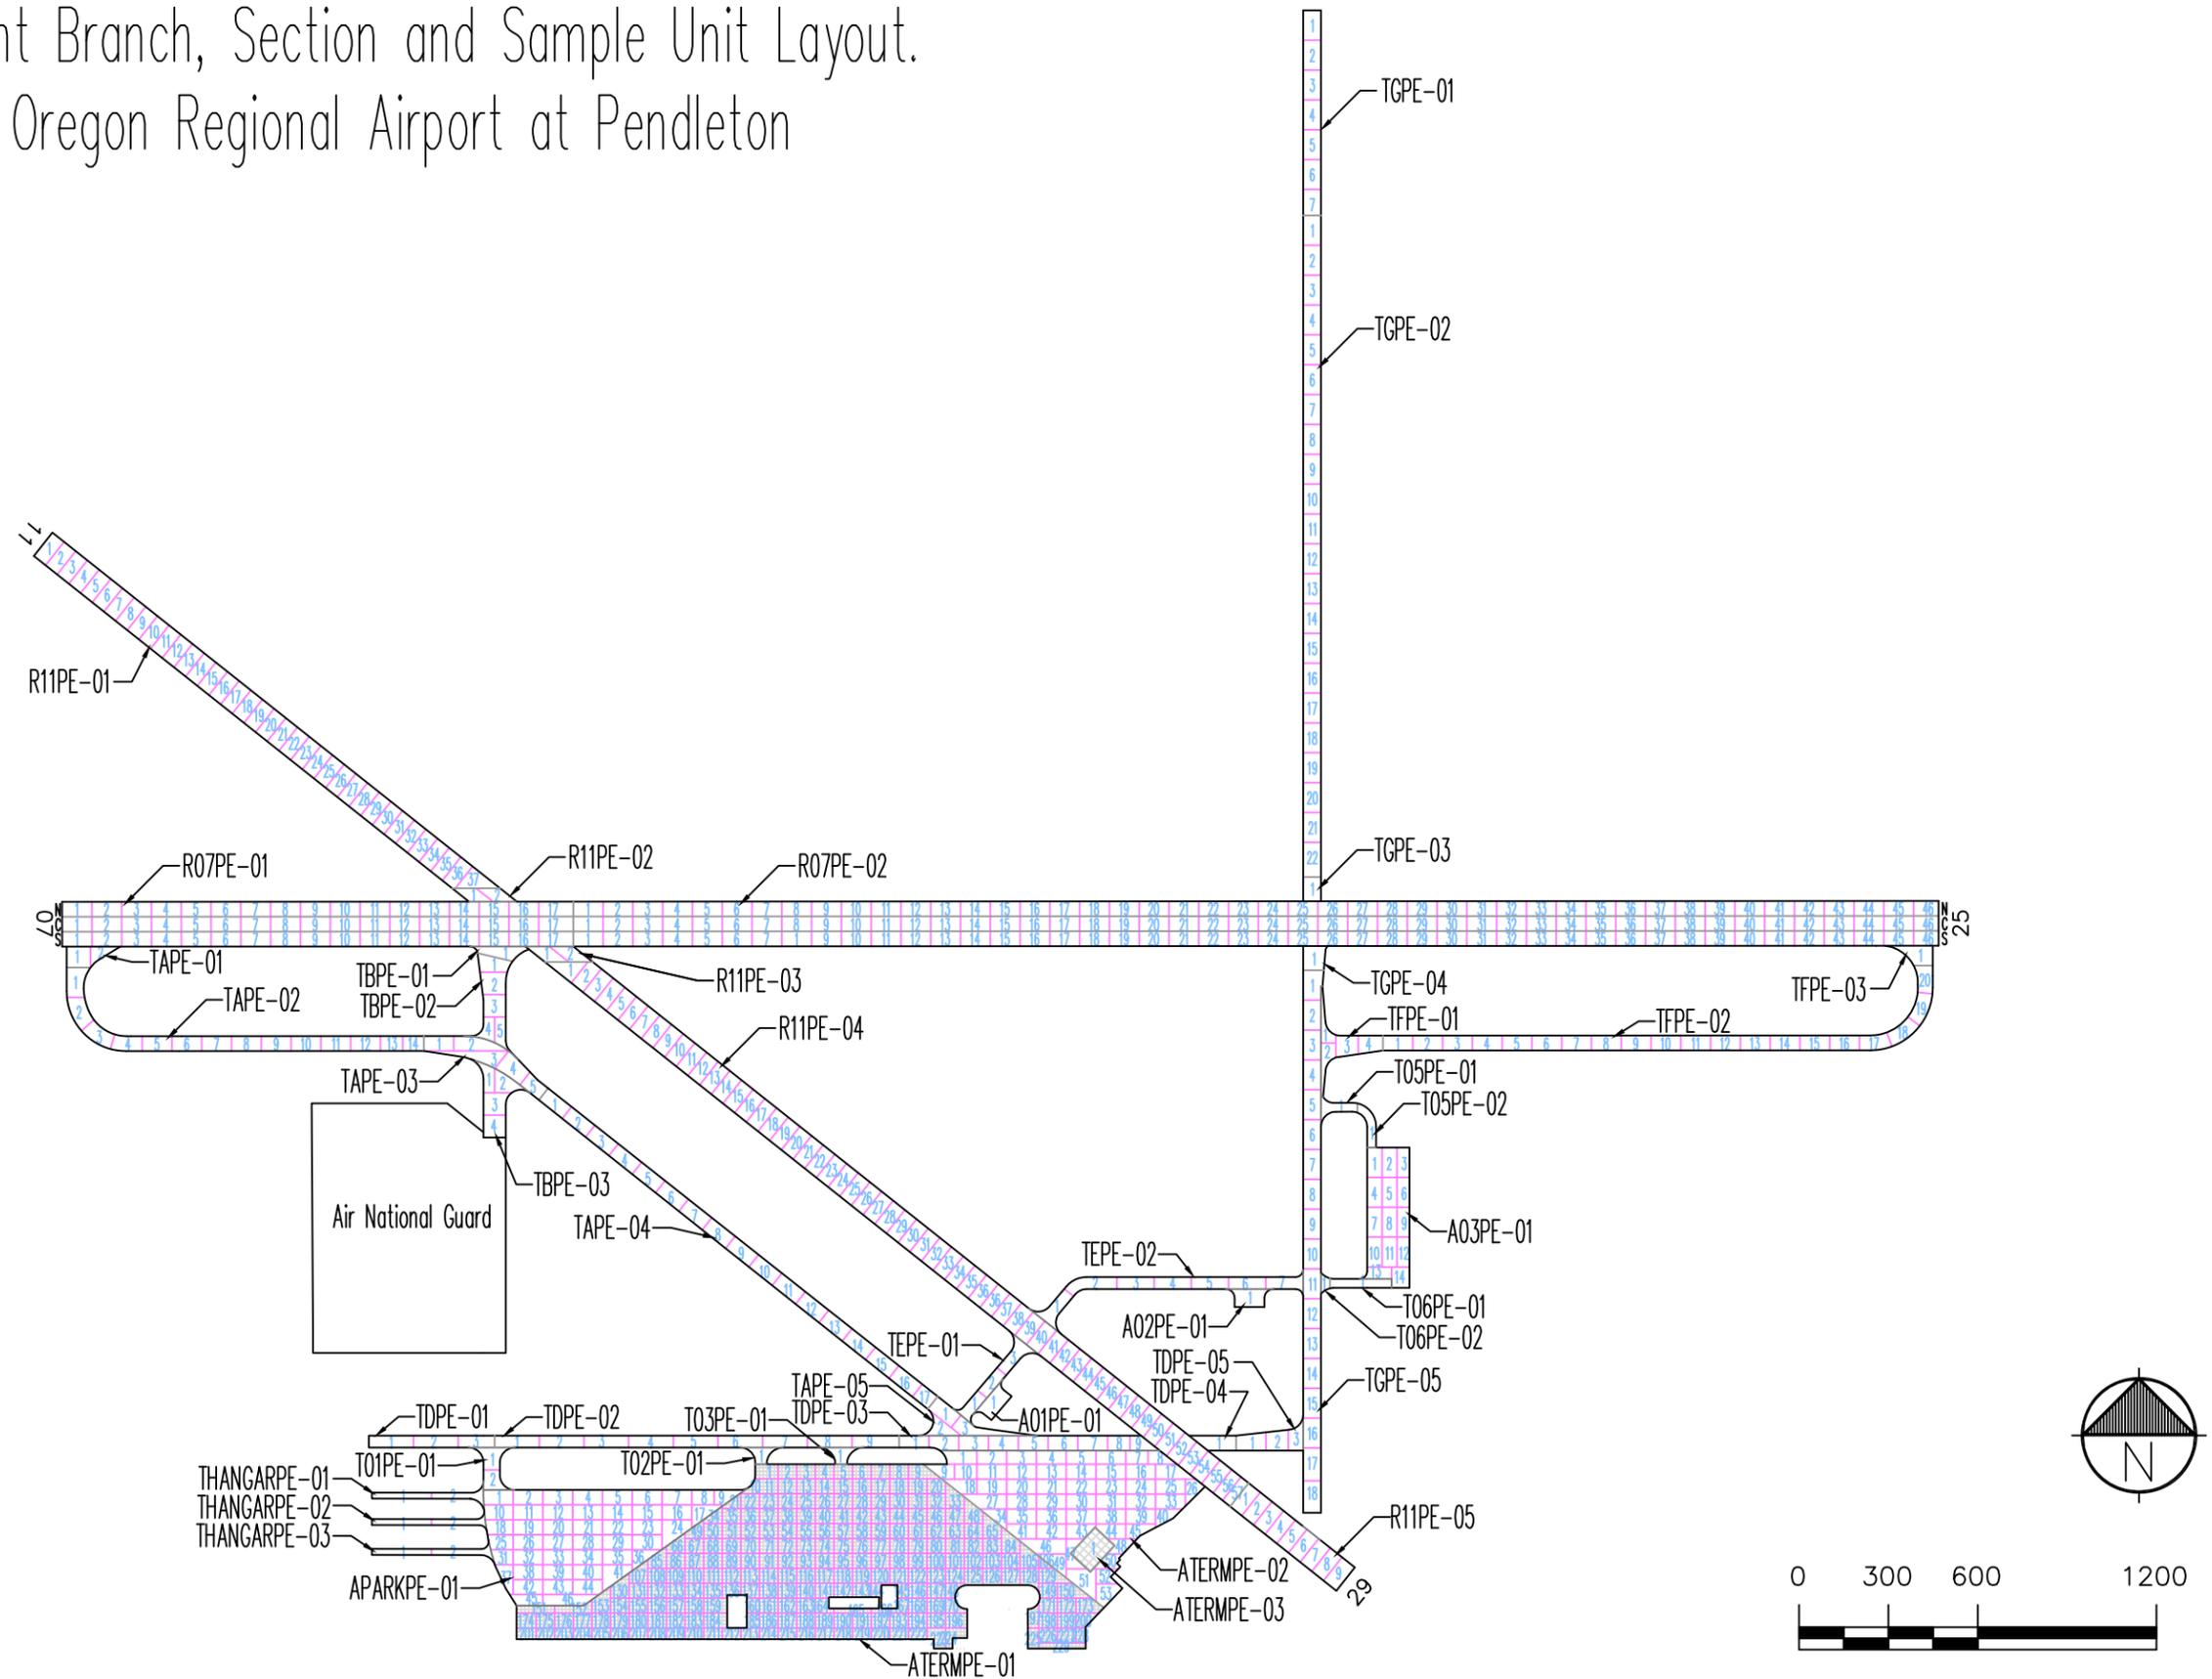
Pavement Branch, Section and Sample Unit Layout.
